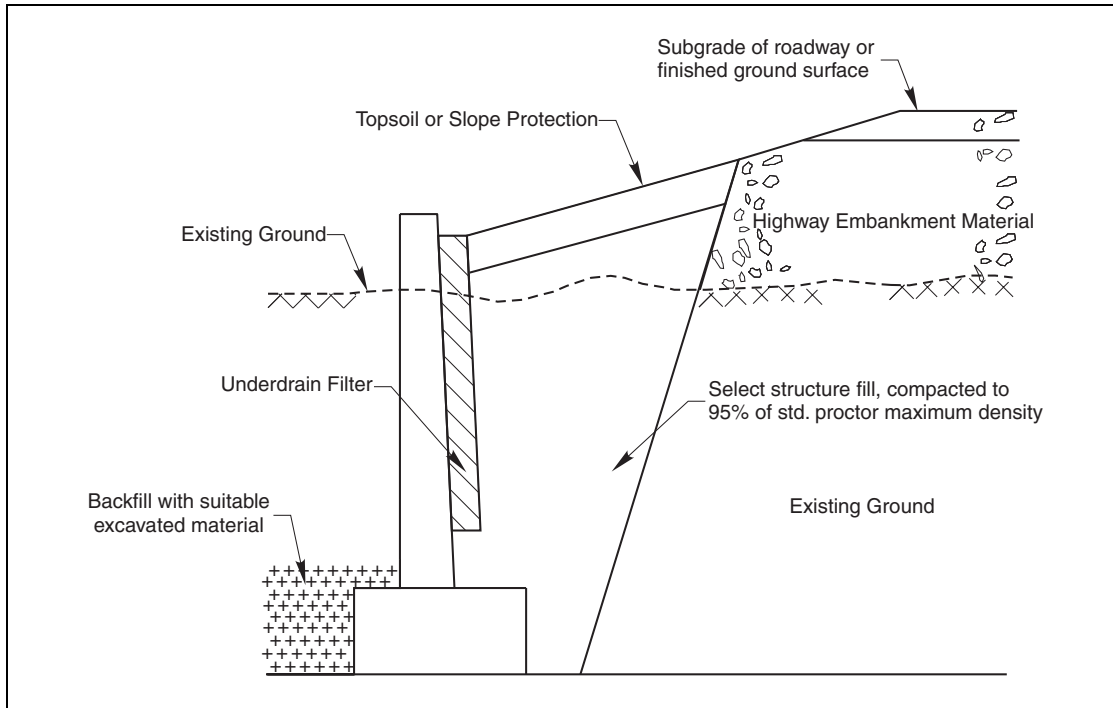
Backfill geometry considering construction of the retaining wall.
